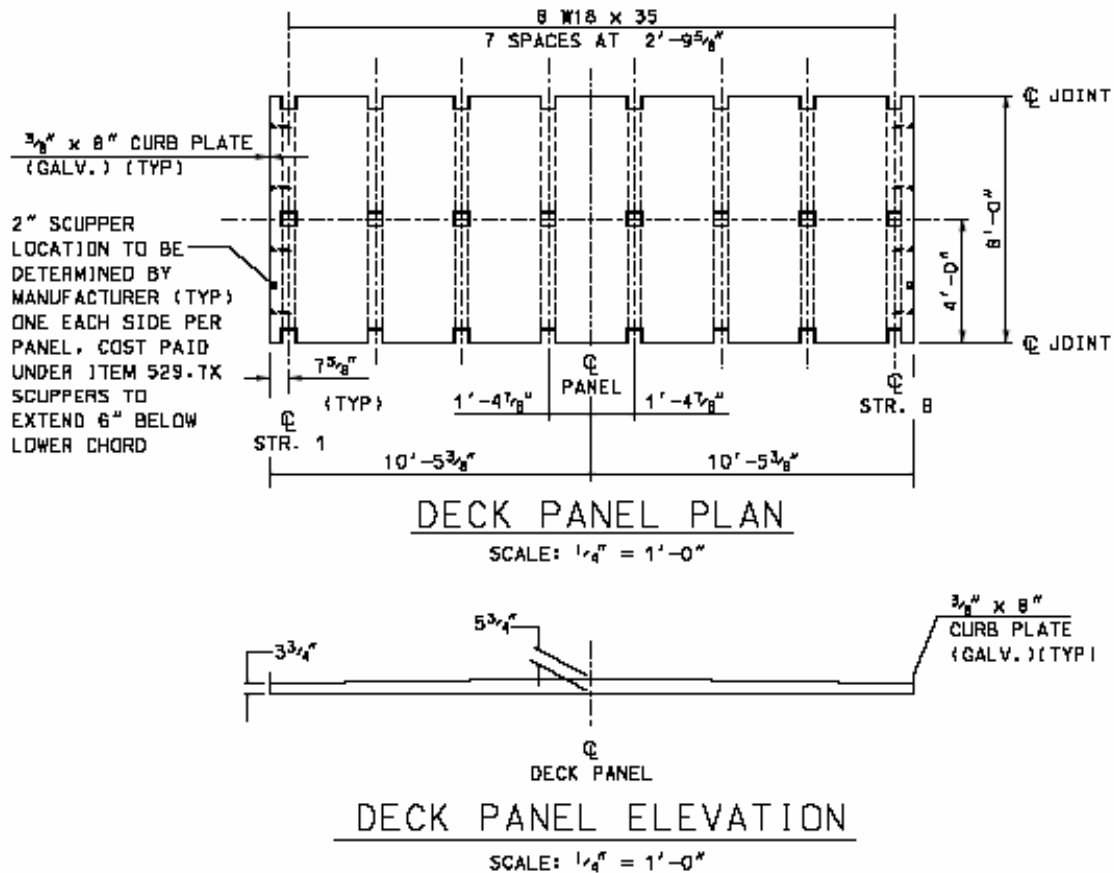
Plan view and cross-section elevation of the panel
